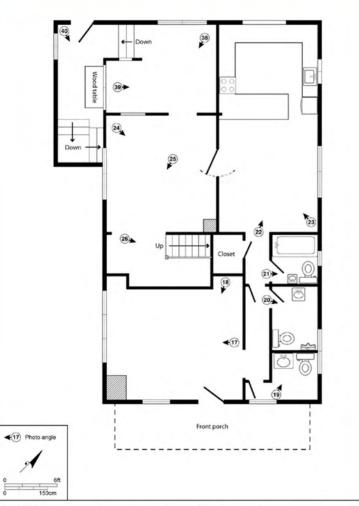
Floor plan of entrance level of former dwelling, as of November 2012, showing direction of interior photographic views.
